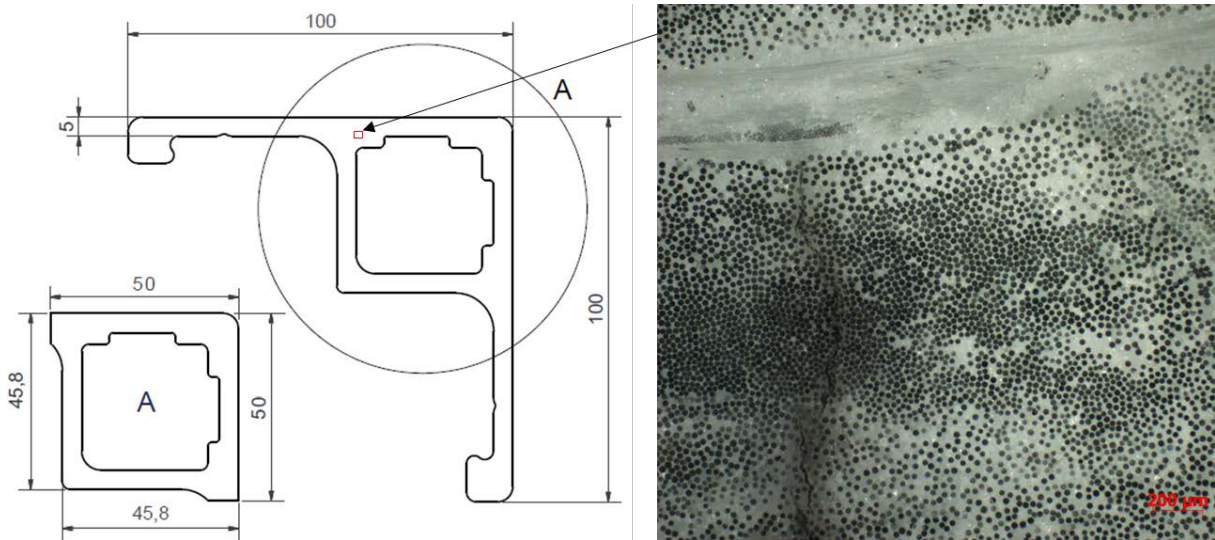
Definition of corner part and profile cross-section with picture of initial failure inside.
